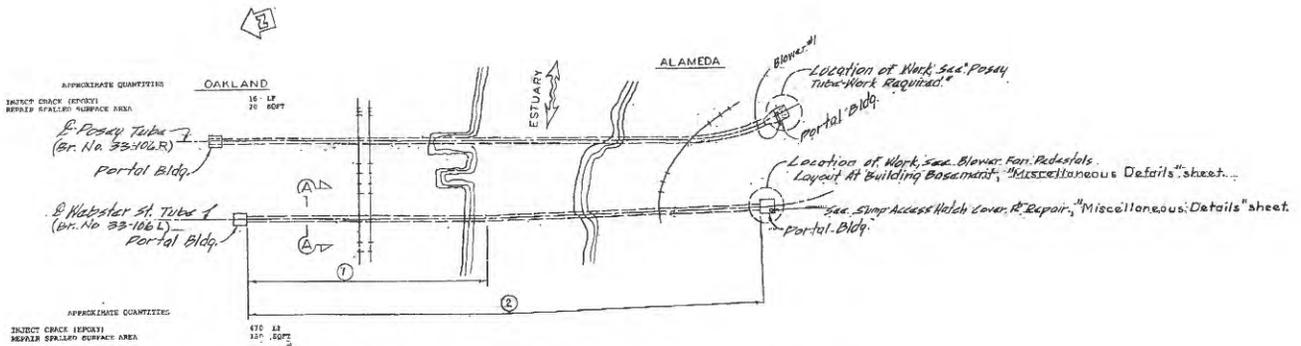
Plan drawing of Posey and Webster Street Tubes showing location under Oakland Estuary.
